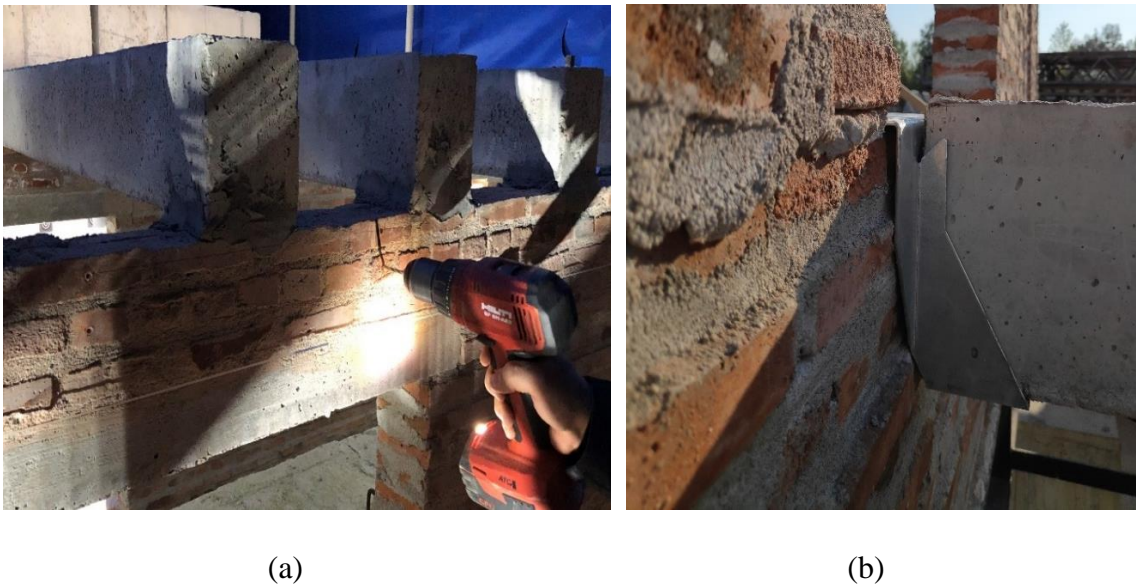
Assembled joists: (a) at the top of the specimen, (b) at the first floor of the specimen.
